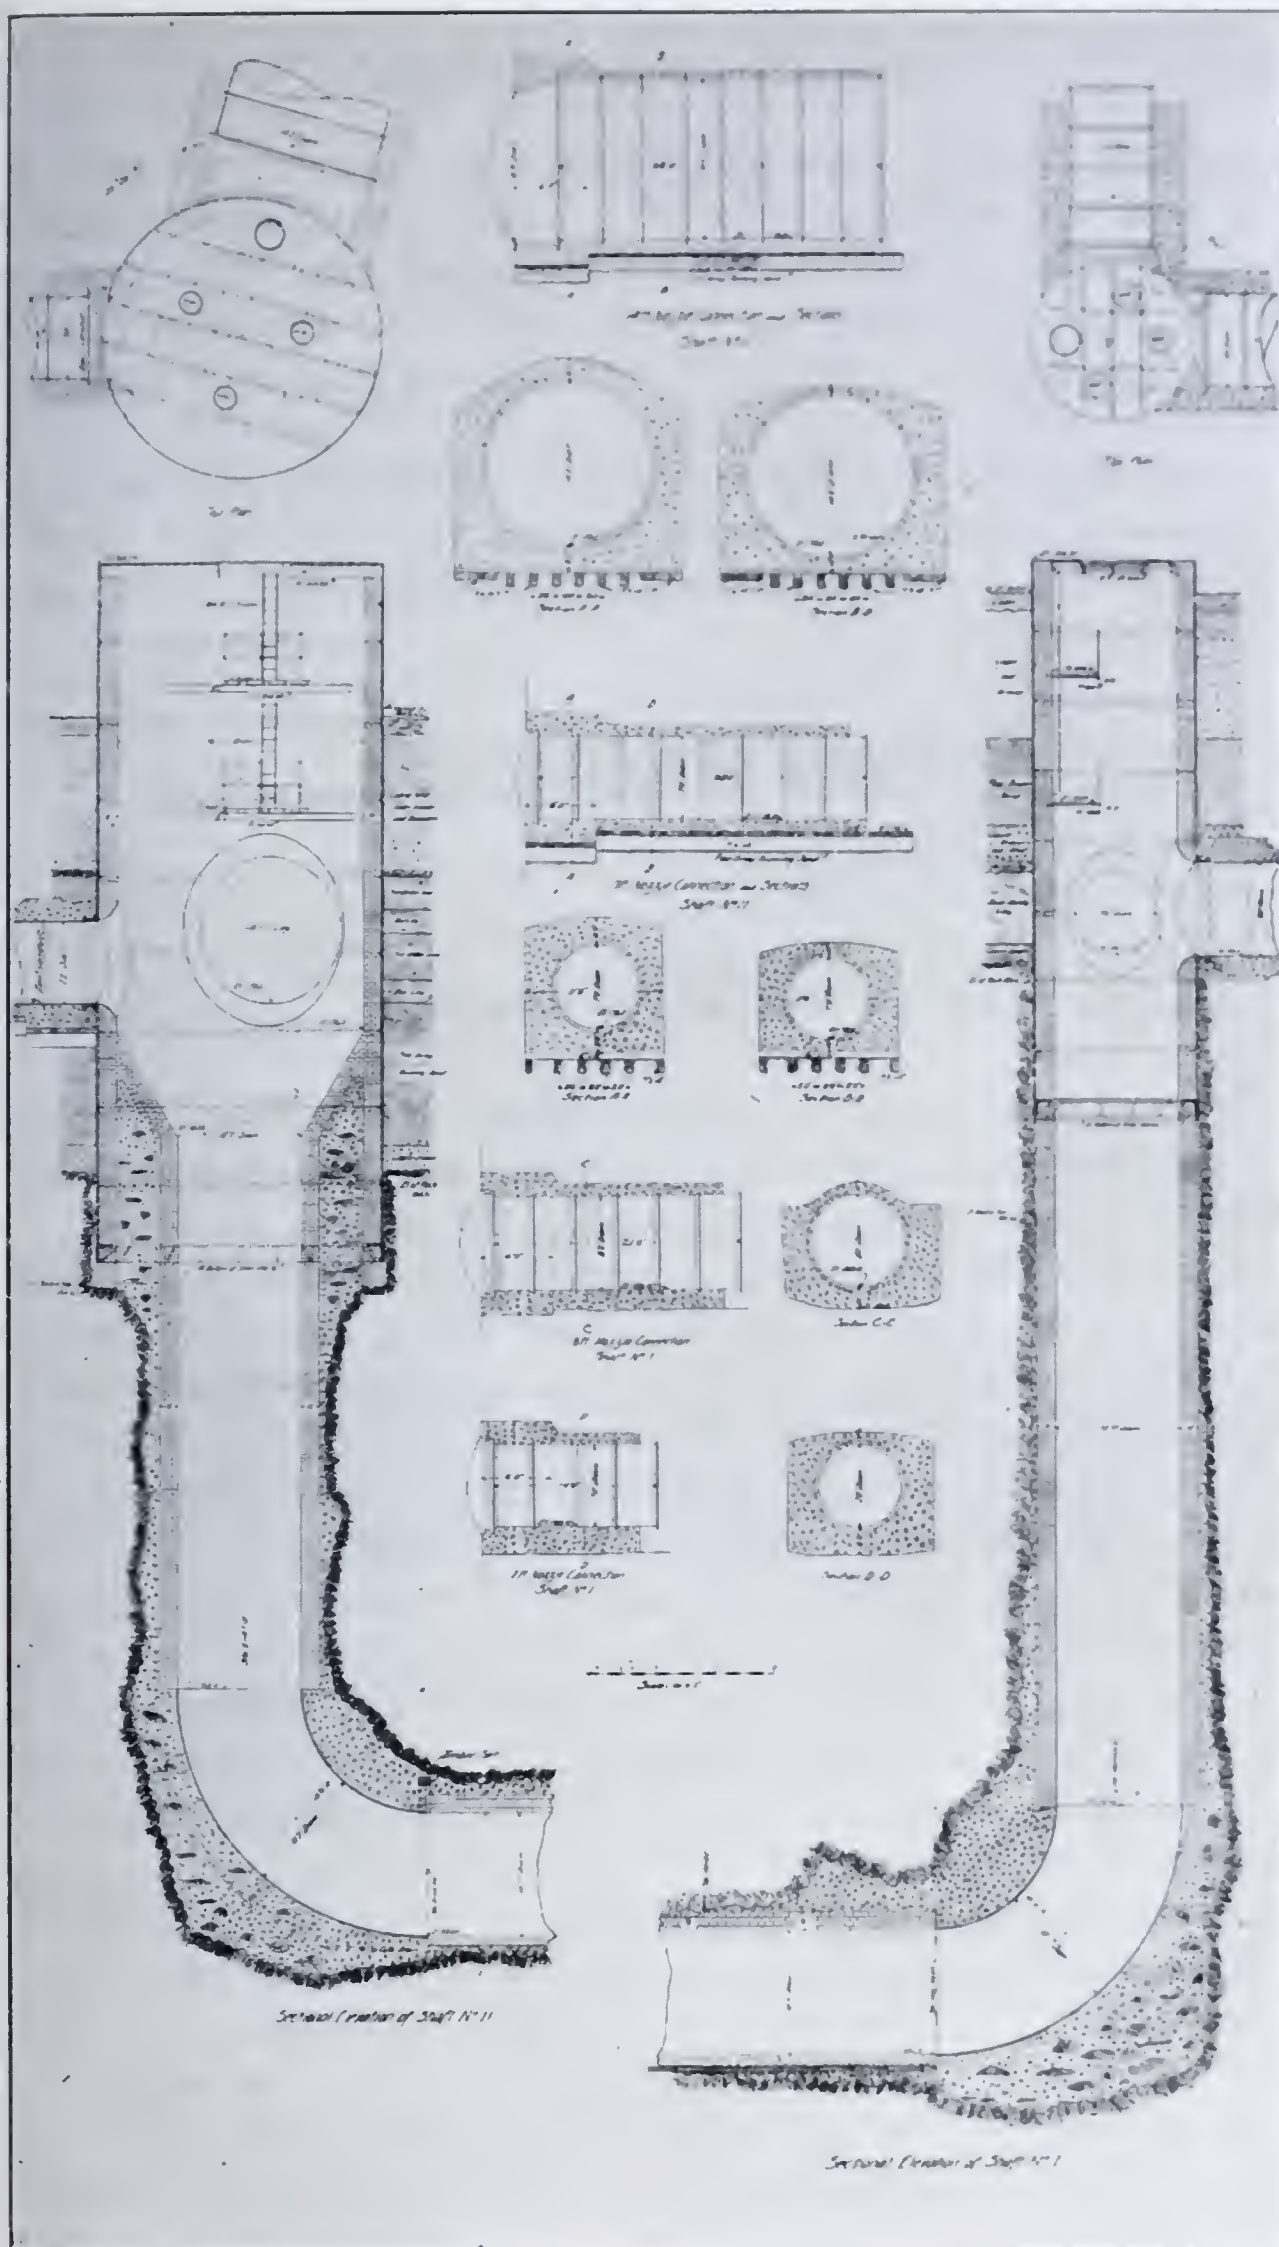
PLATE I.—TYPICAL SECTIONS OF SHAFTS NO. 1 AND NO. 11.
